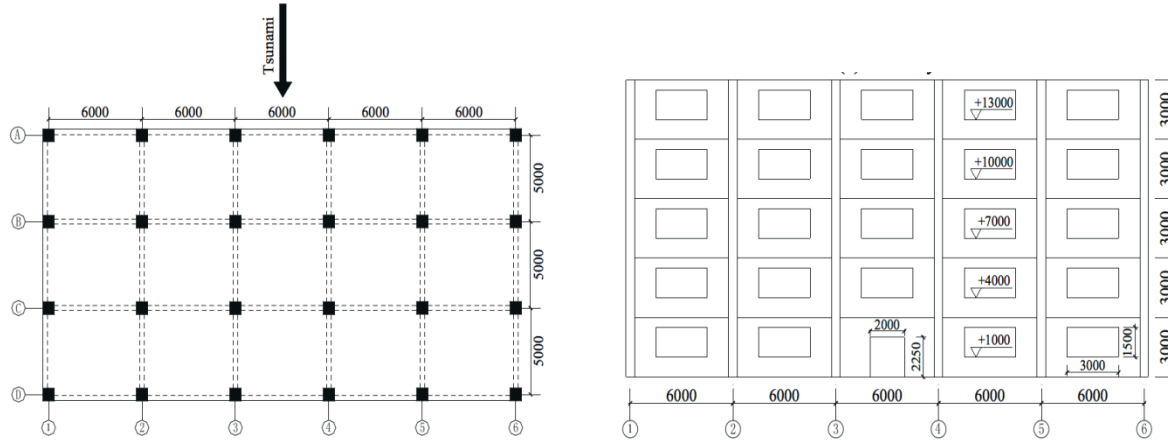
Plane and elevation layout of the structure (in mm)
